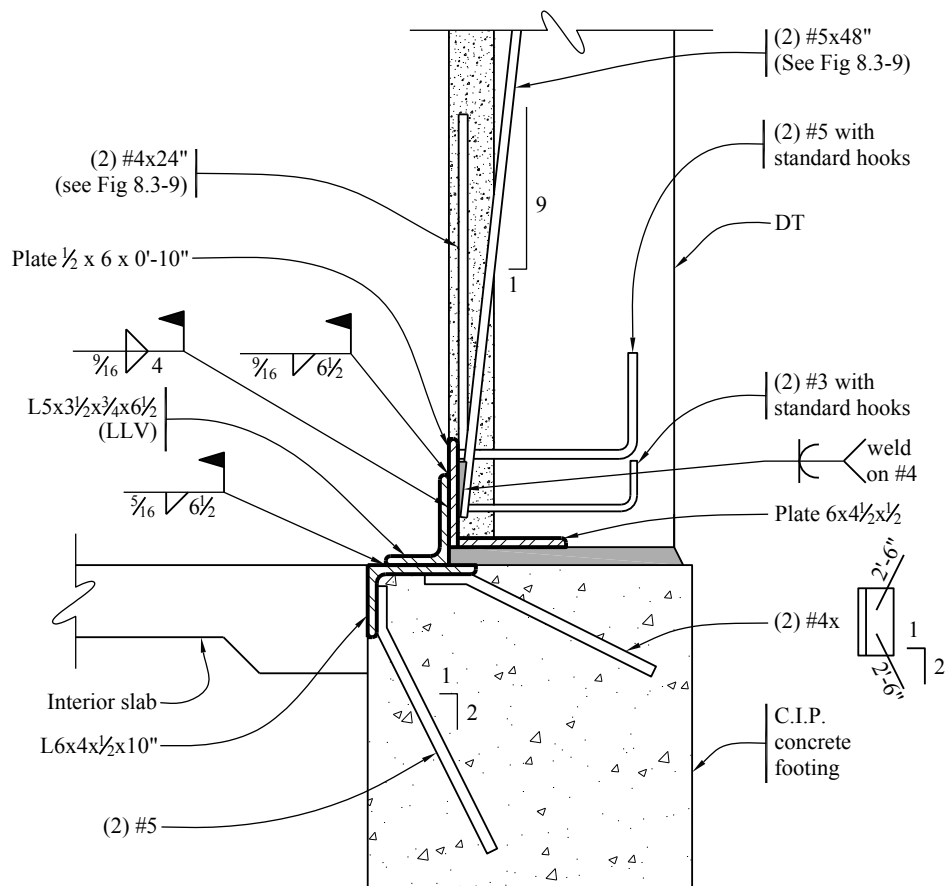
Section at the connection of the precast/prestressed shear wall panel and the footing
